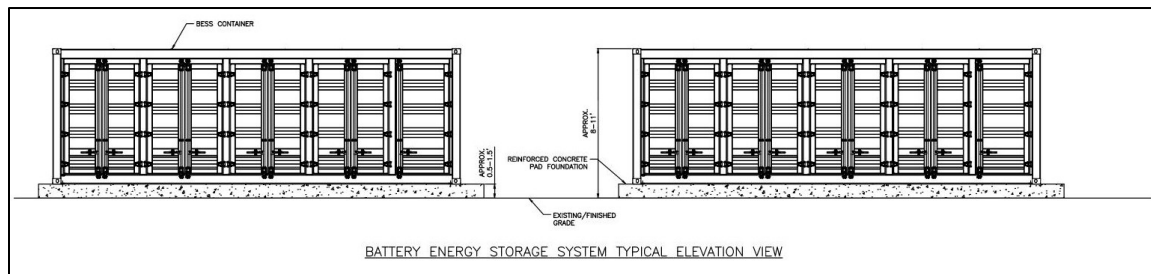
Battery Energy Storage System Typical Elevation View
